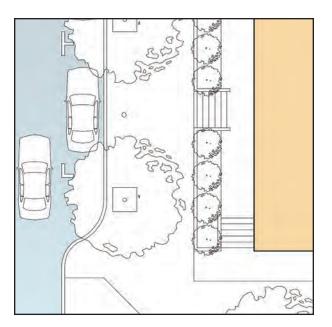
Plan View, Raised Terrace Front Frontage (Illustrative)
